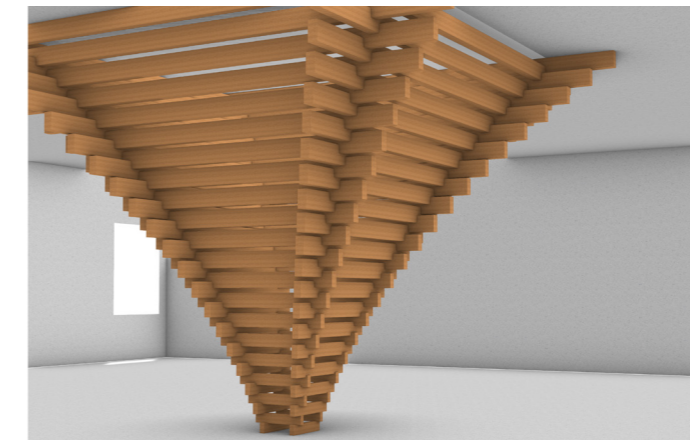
Discrete timber column without roof light (own work, 2024)
